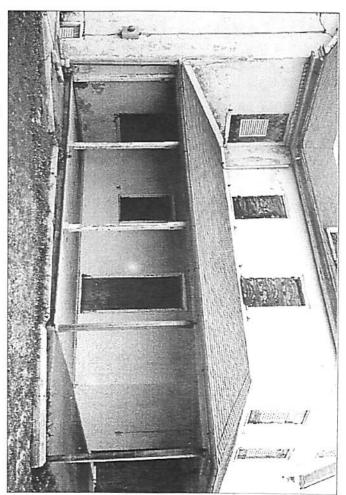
View of the wraparound wood entrance porch on the east elevation of the house.
